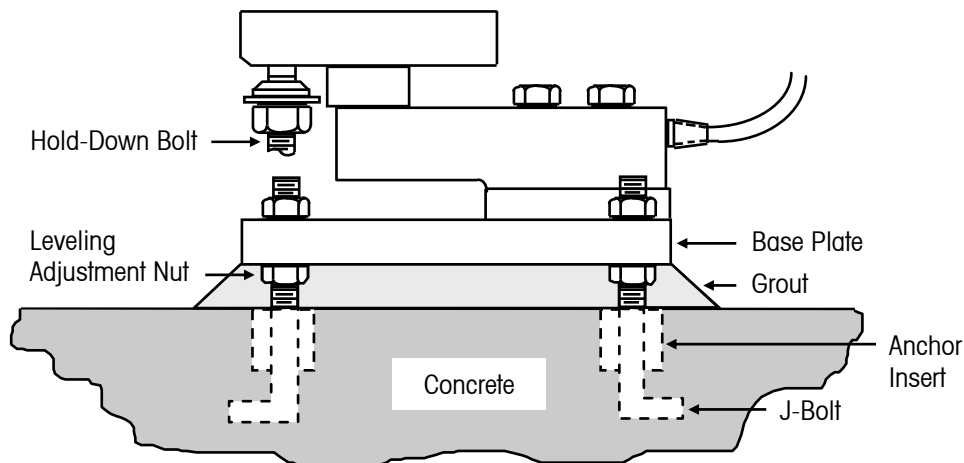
Base Plate Bolted to Unevel Concrete Floor
